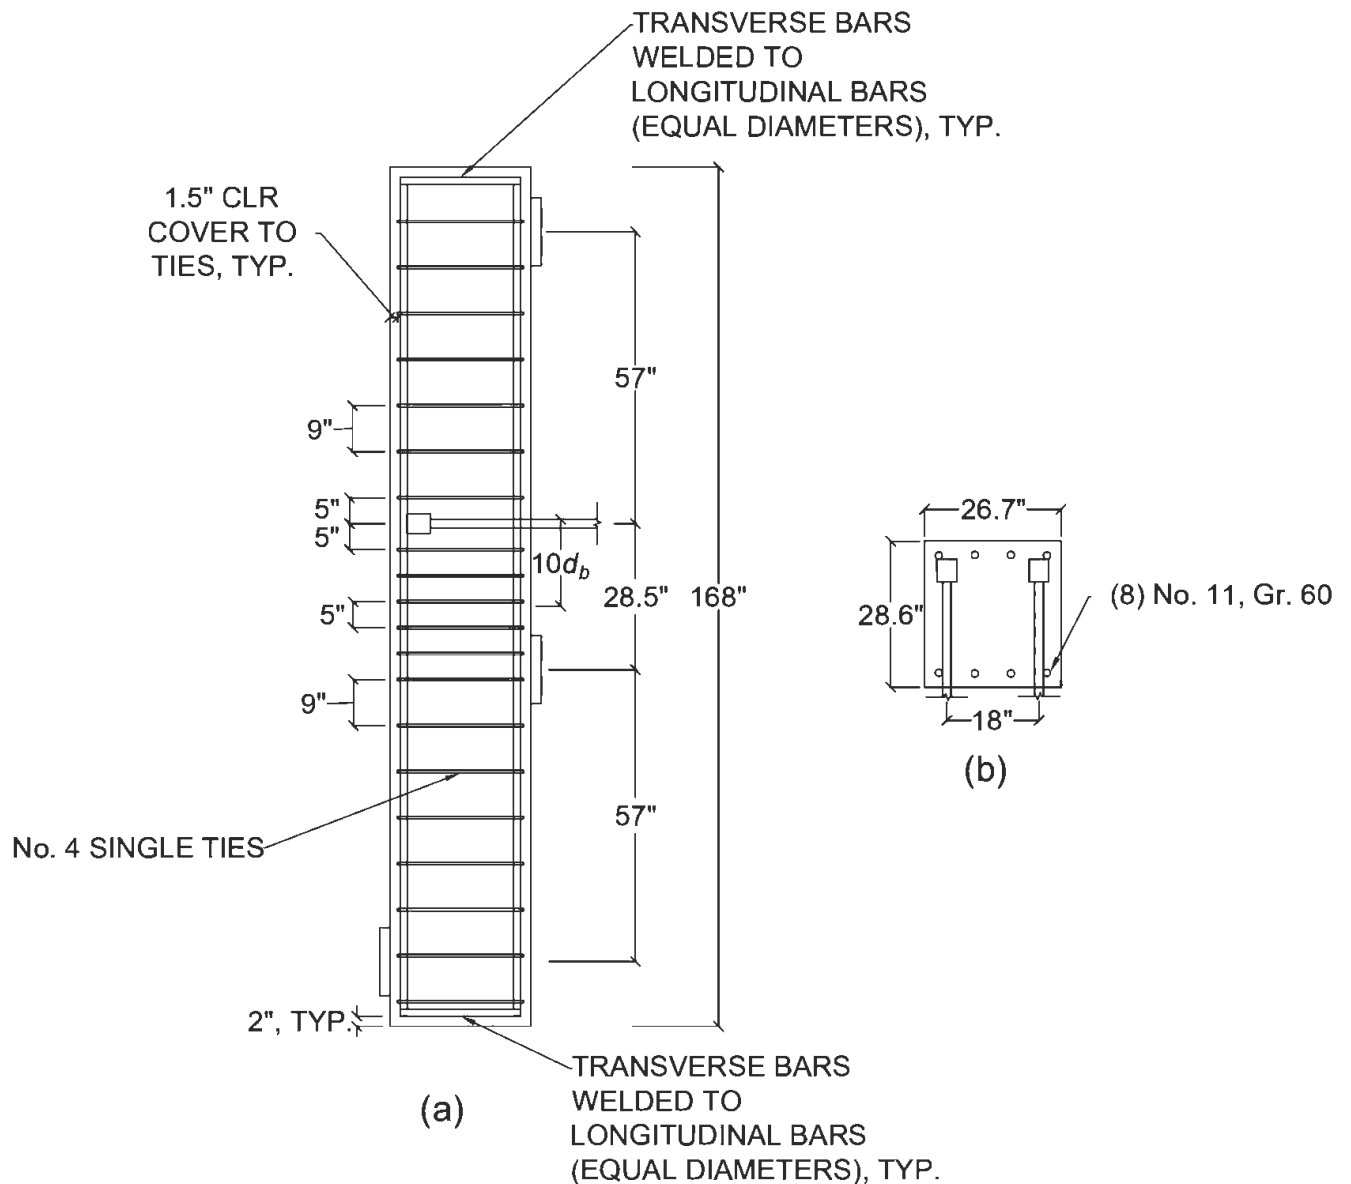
Details of reinforcement layout for No. 14 headed bar specimen 14-2: (a) elevation, (b) cross-section
